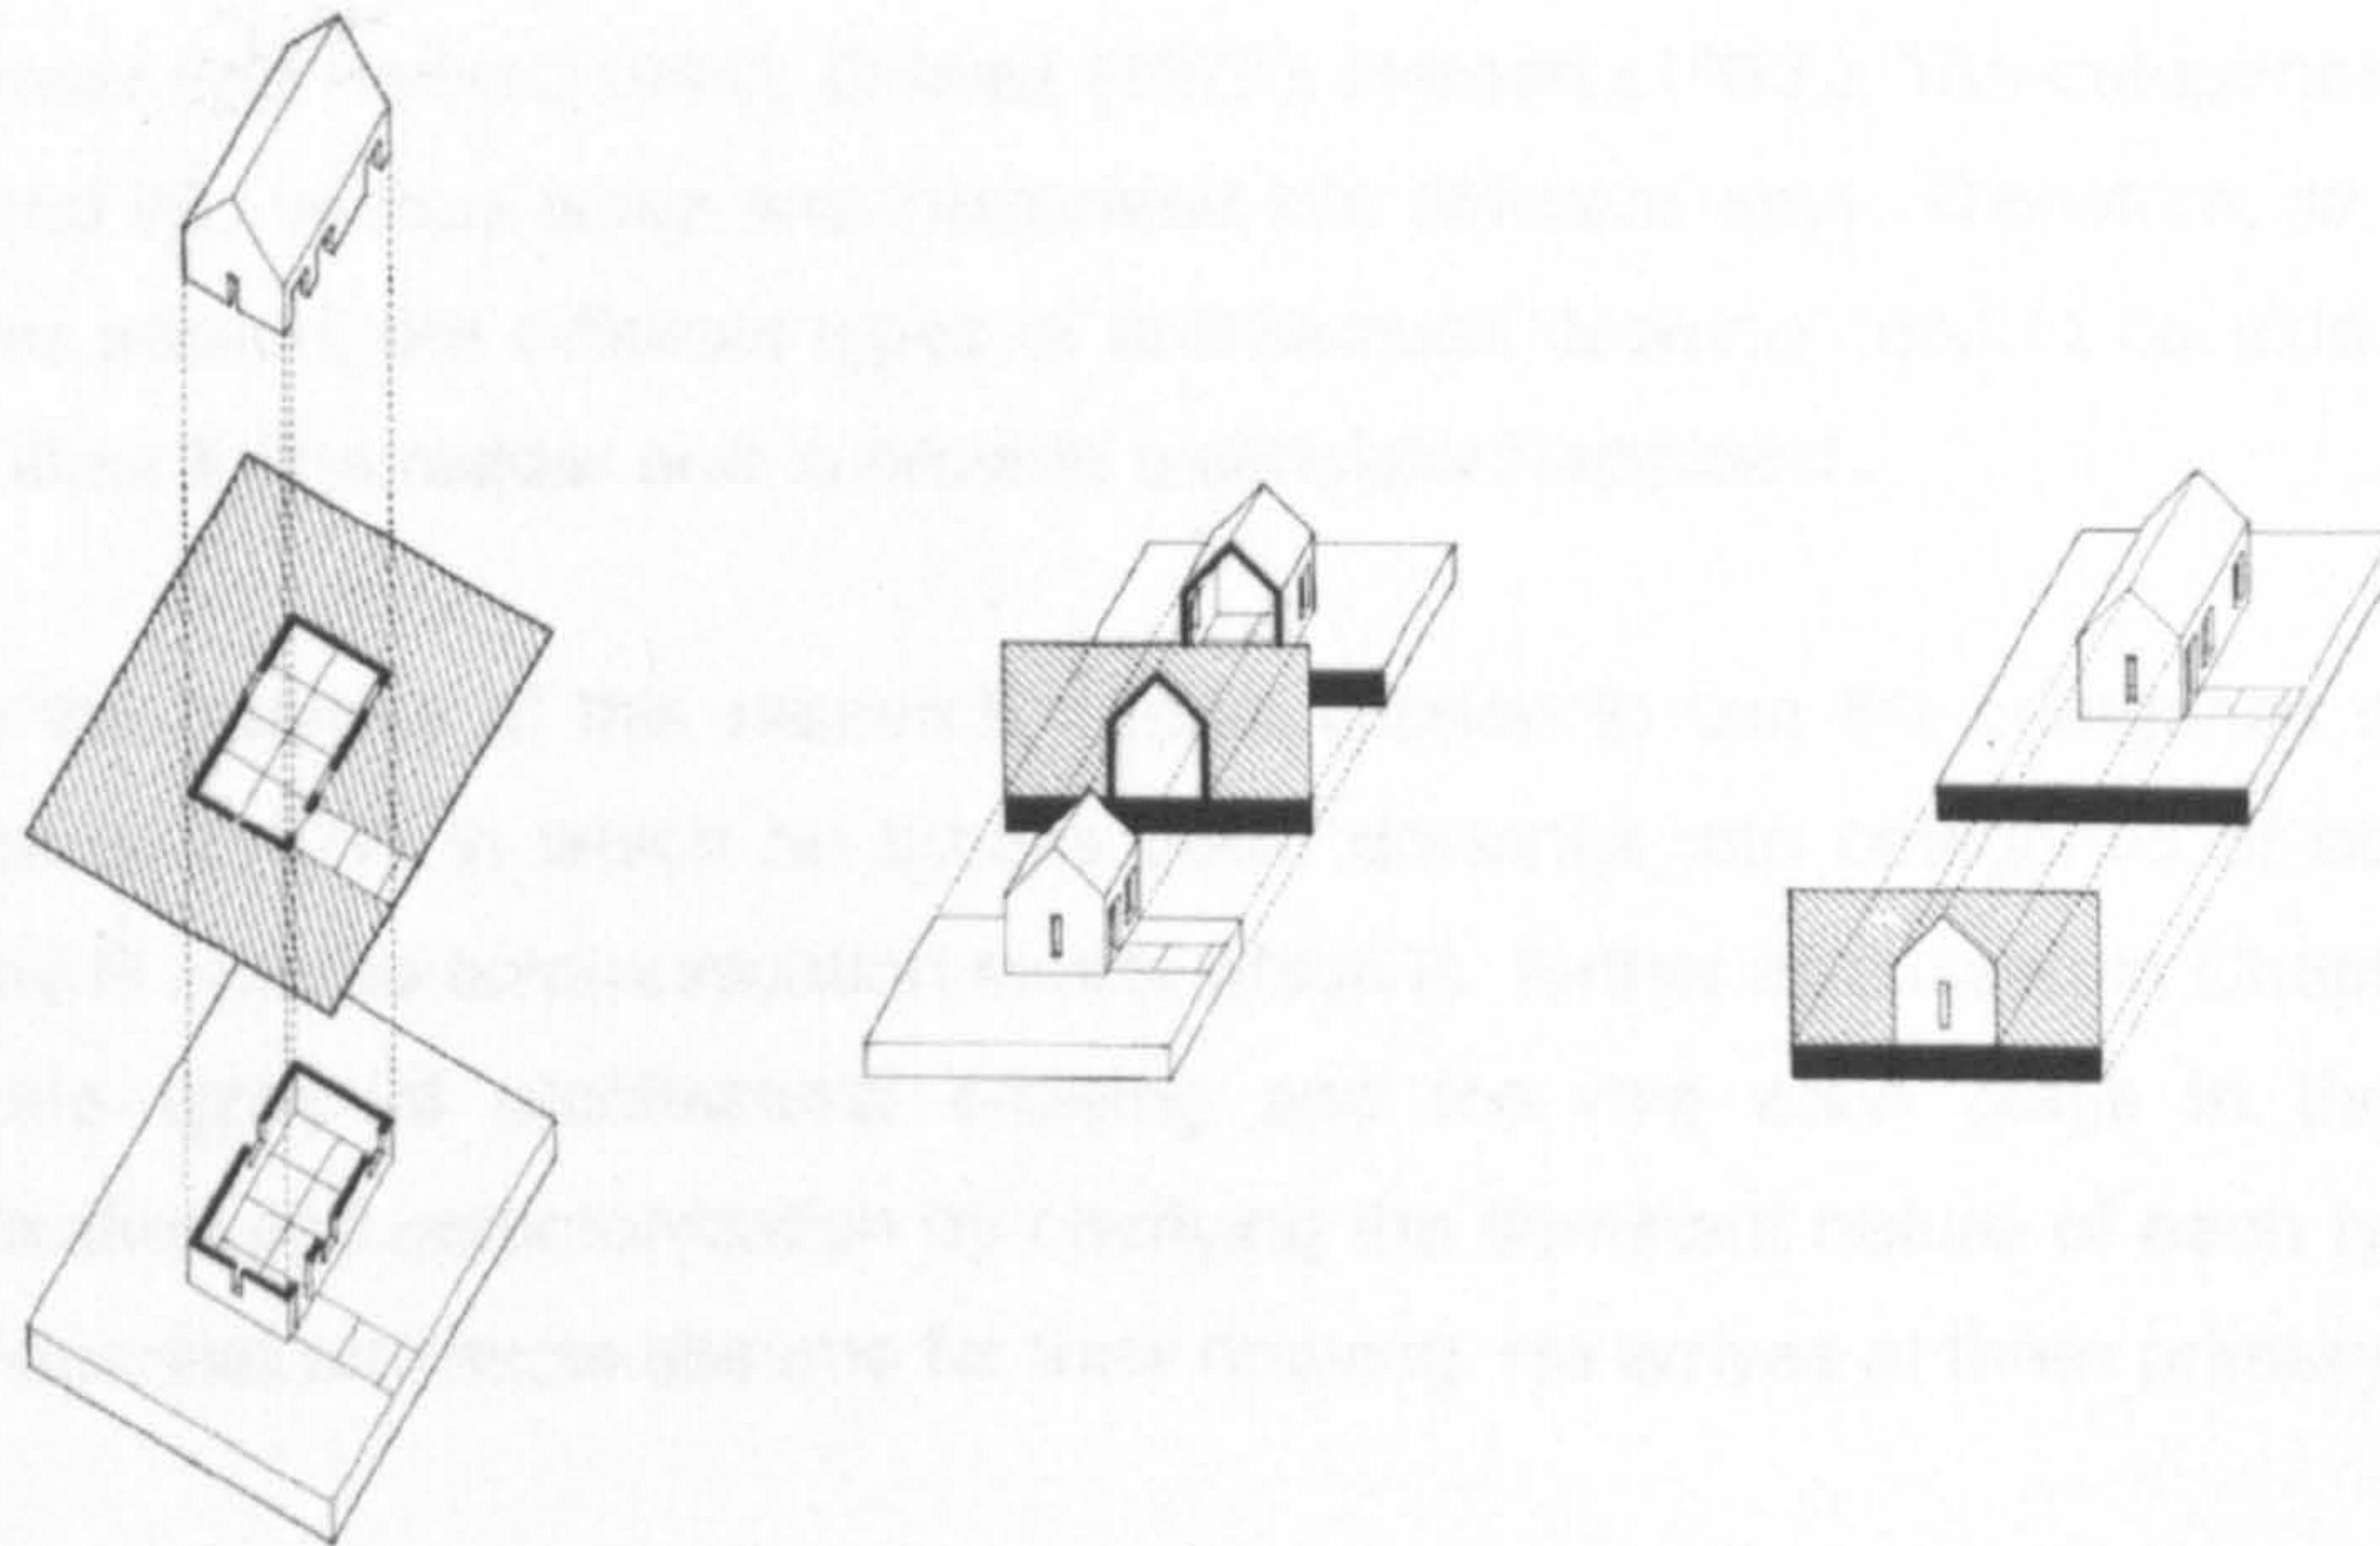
Plan, section, and elevation (from left to right). Fraser and Henmi (1994: 42-3)
